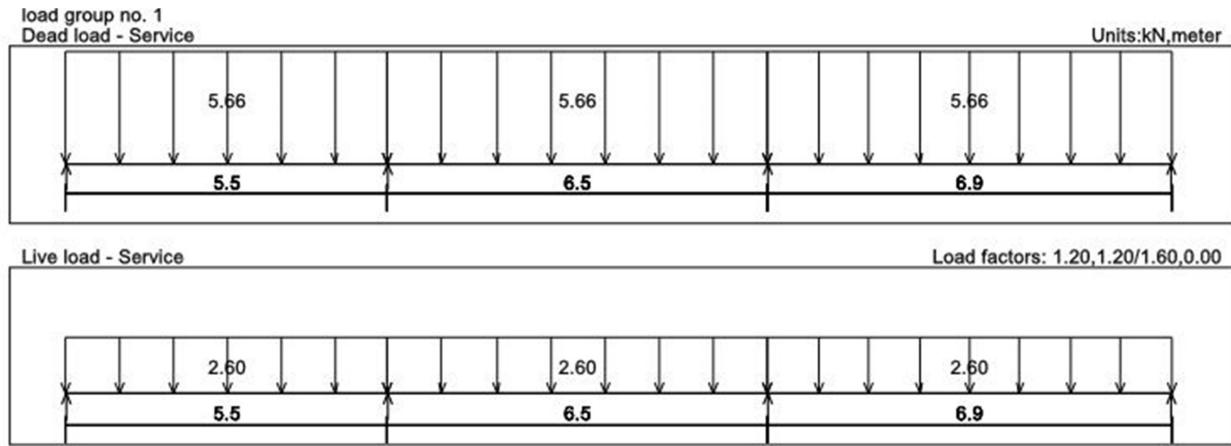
Statically System and Loads Distribution of Rib(R26).
